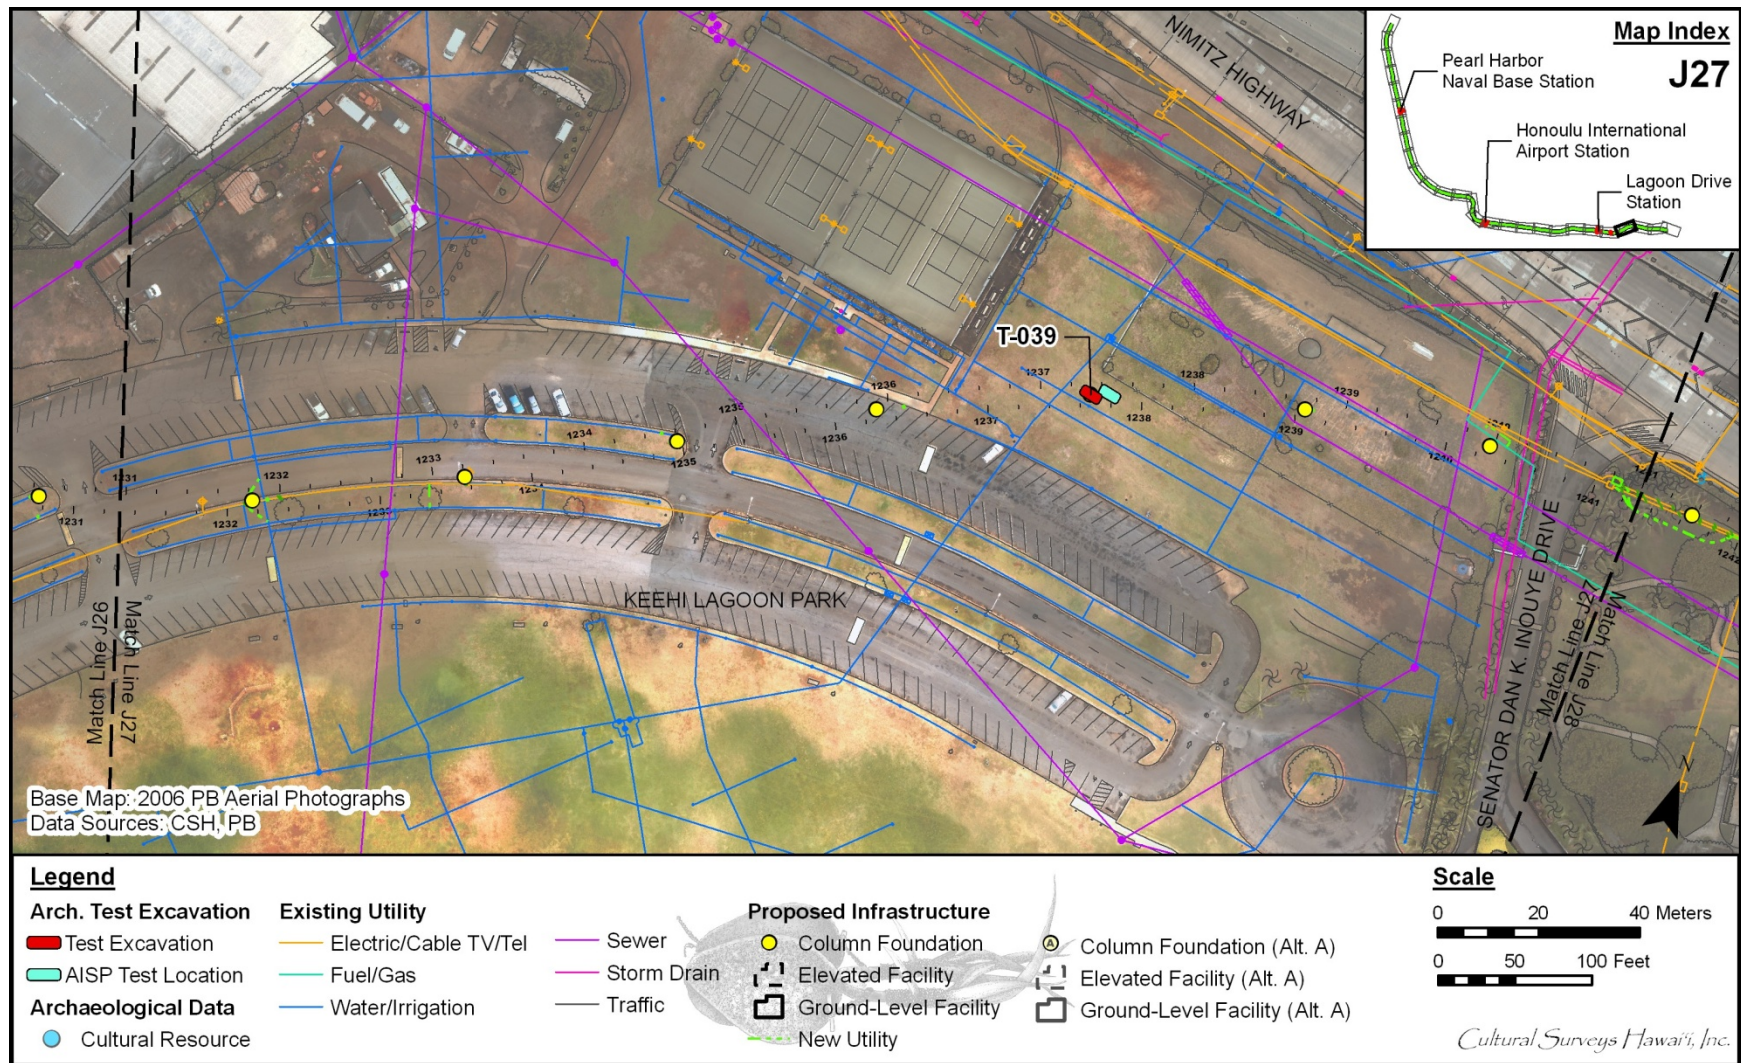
Map Sheet J27, one test excavation (T-039) at column foundation @ 1226+50
